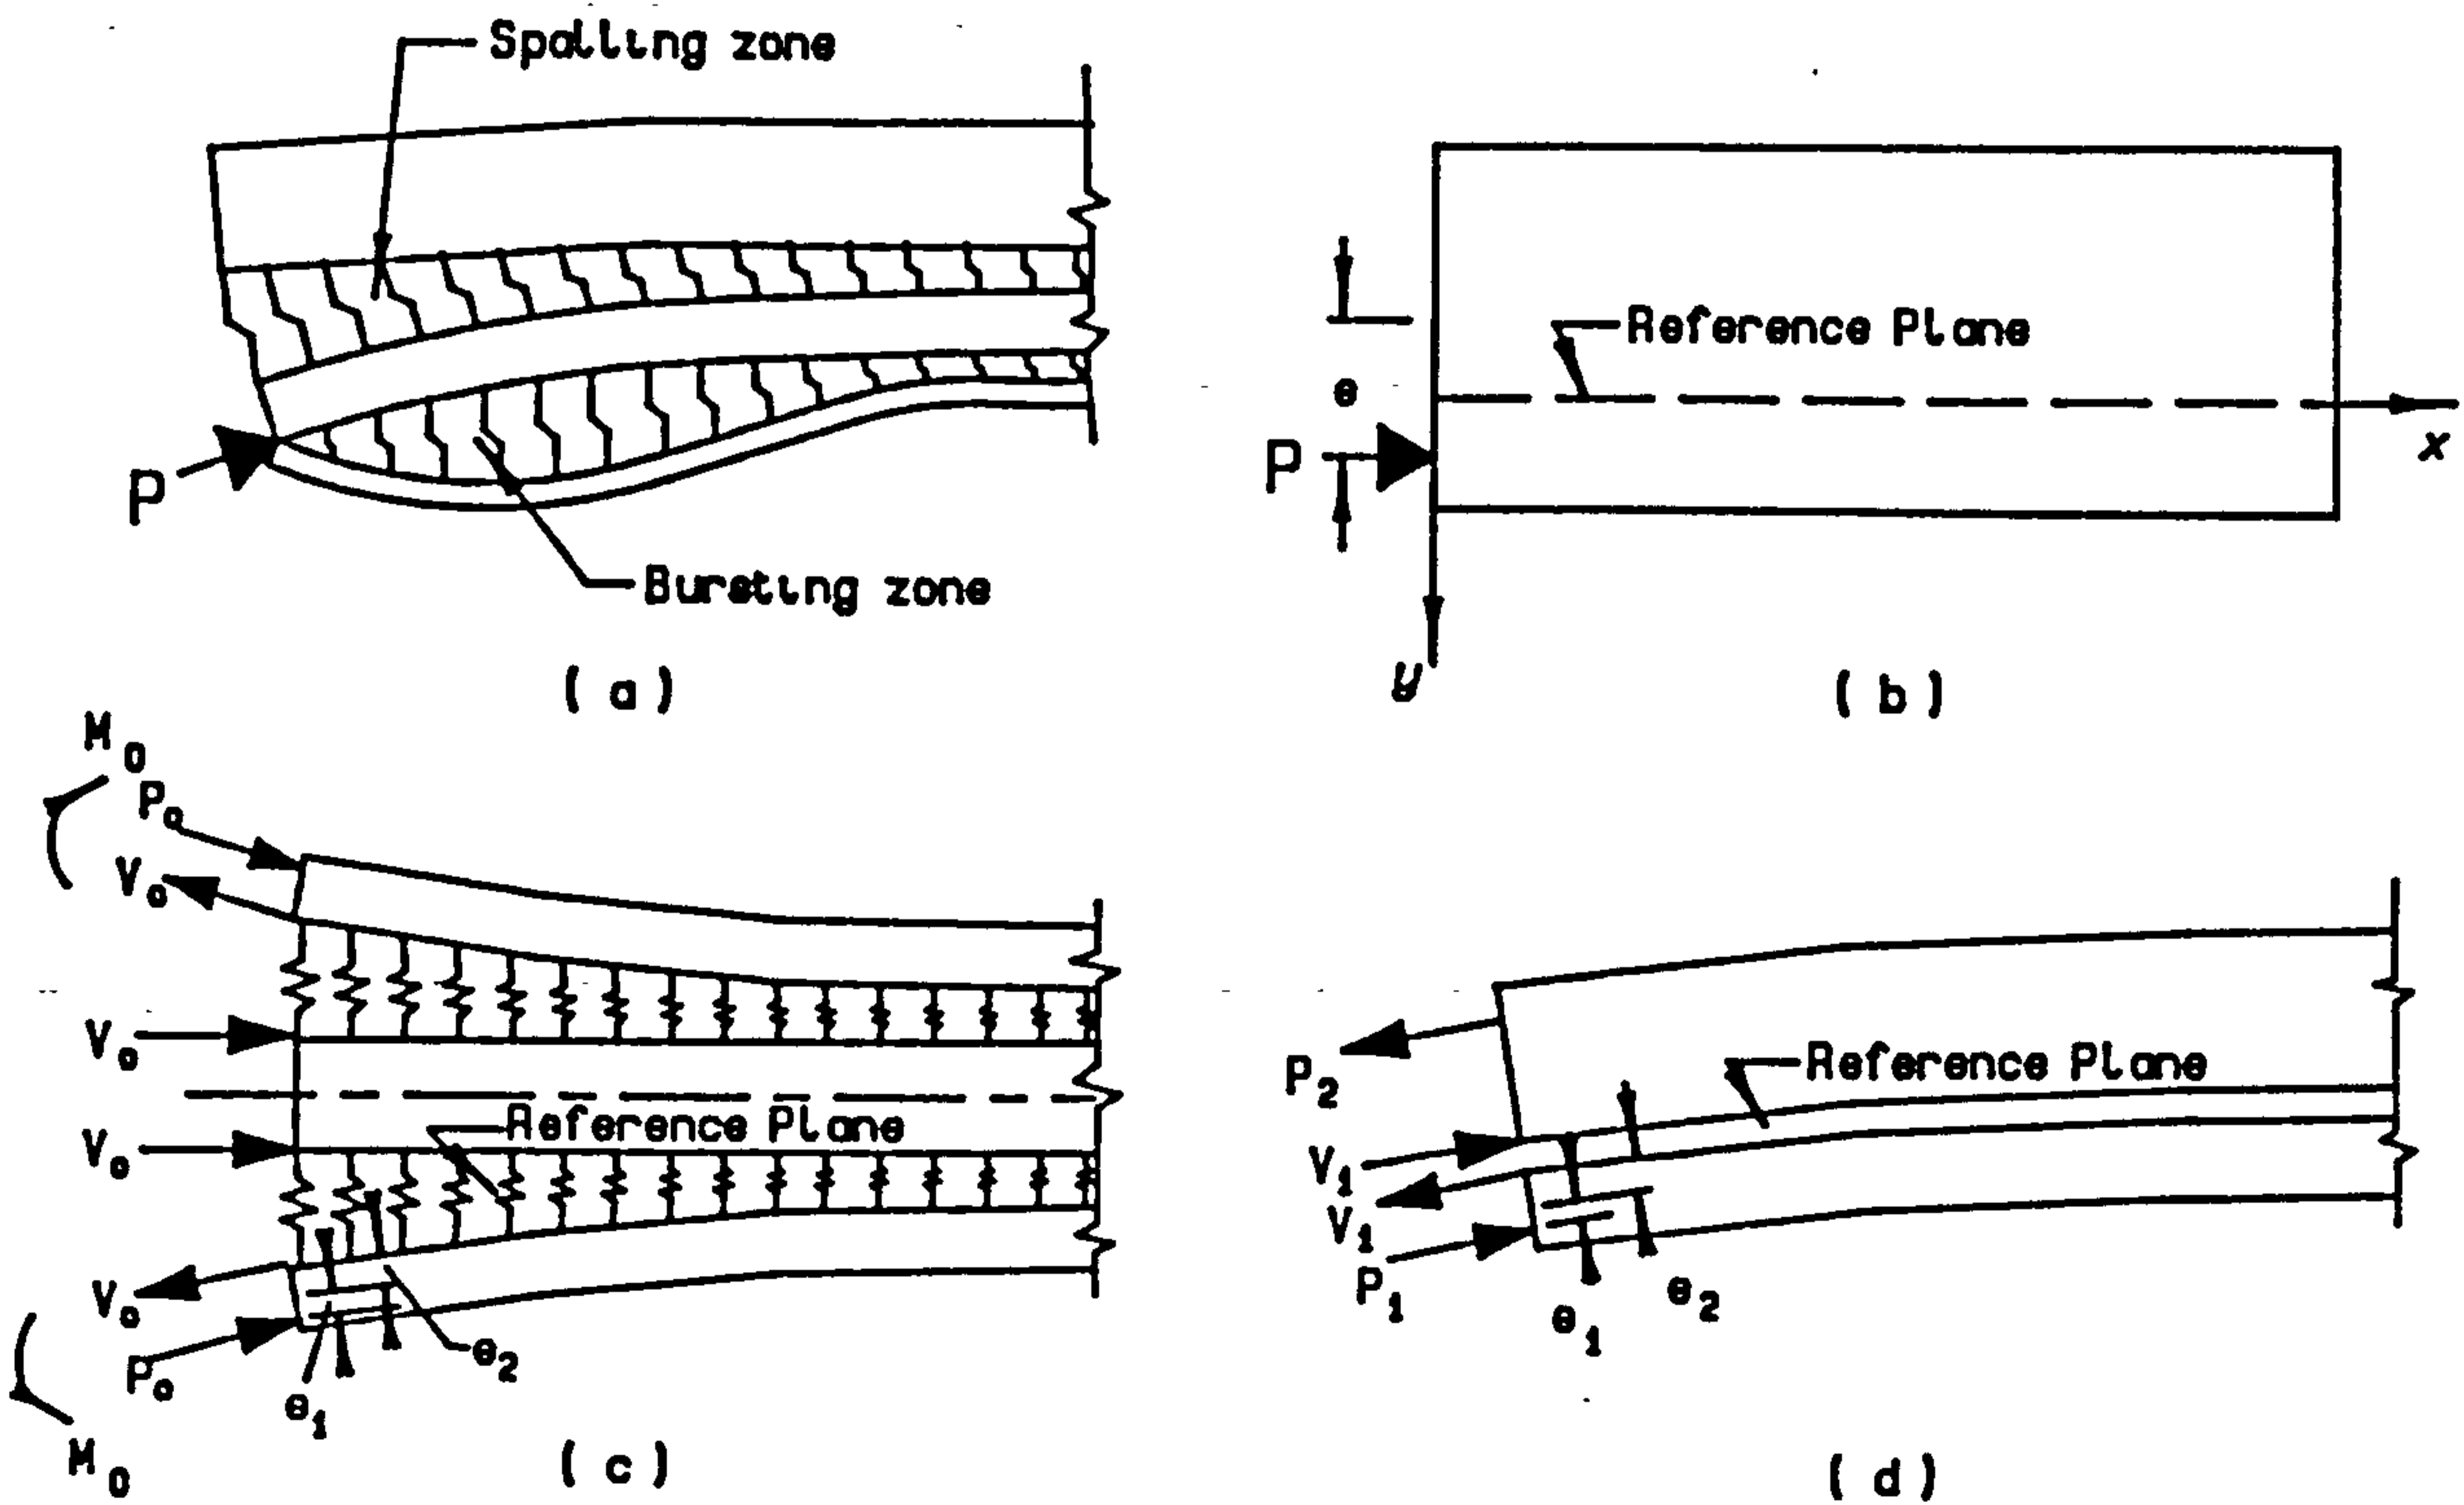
Failure mechanism of concrete loading bearing block by Lenshow.
